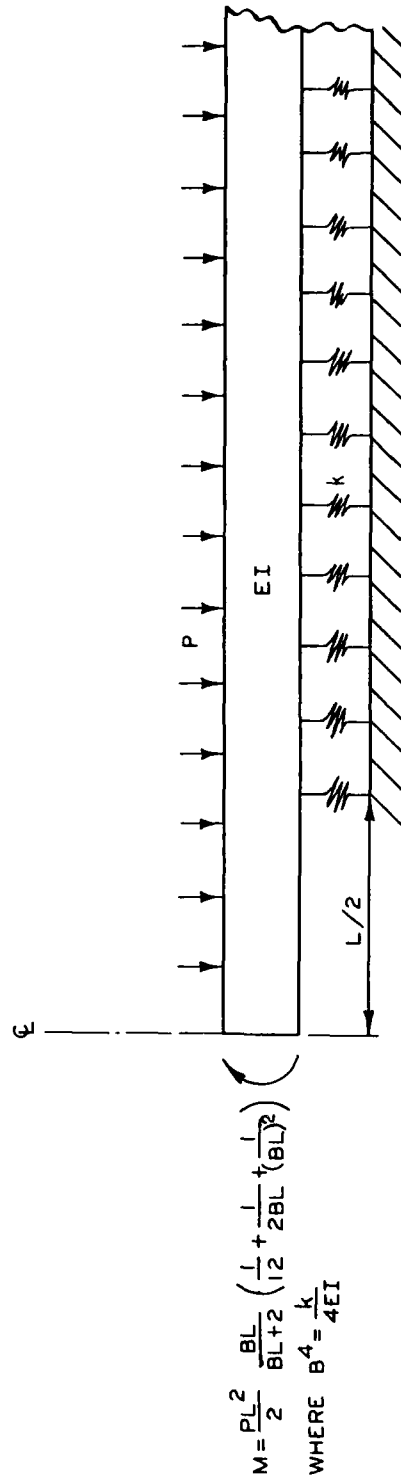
Longitudinal bending of concrete lining by loss of foundation support
